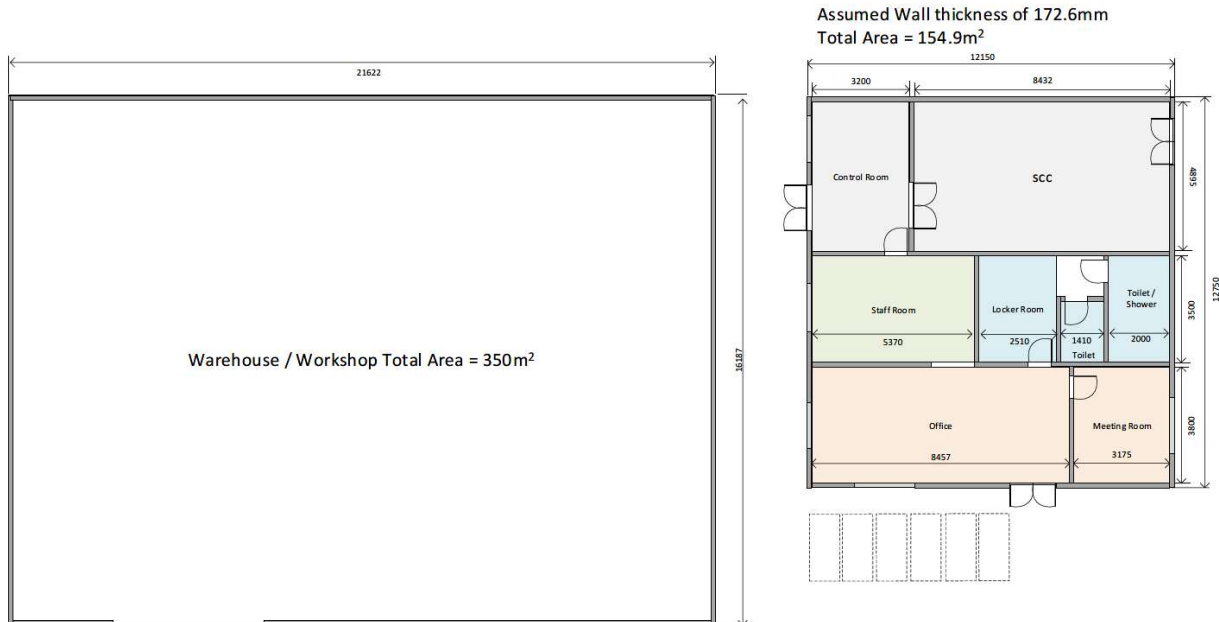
Layout plan of operations and maintenance buildings (Source: Nova)
